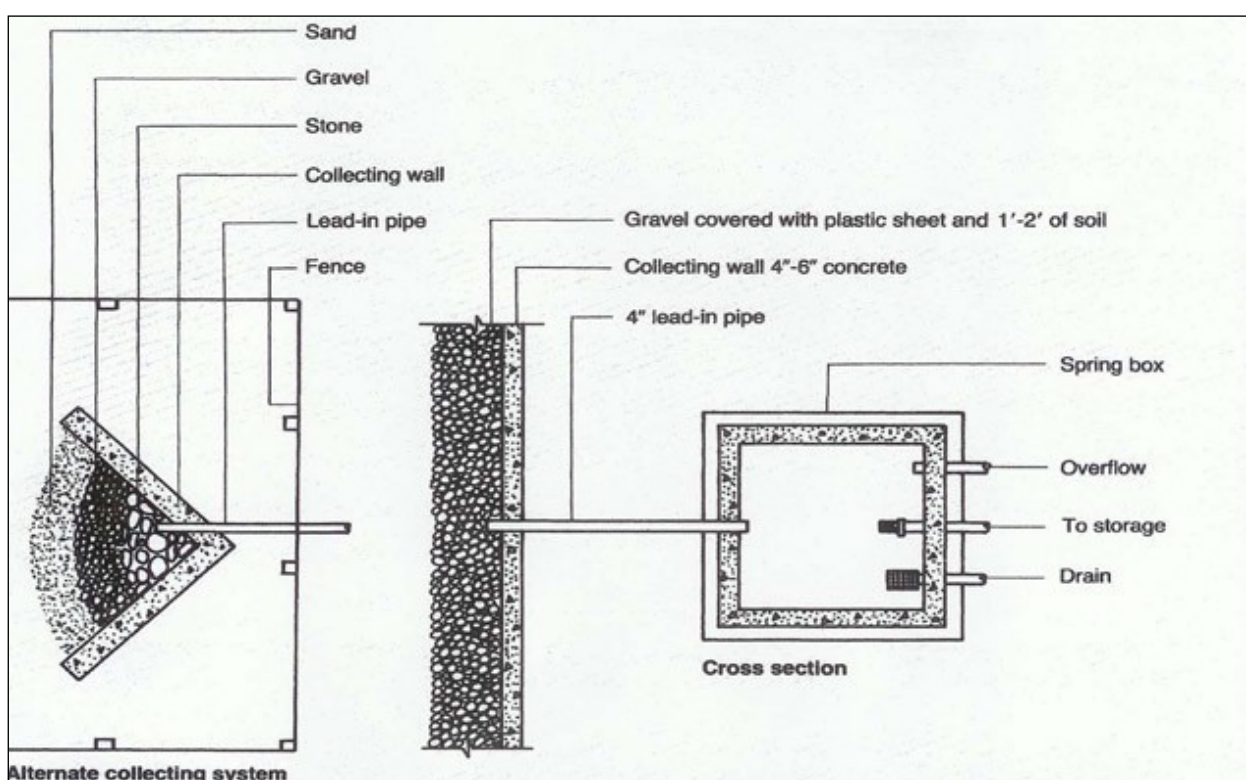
Alternative collecting system and cross sectional view of concentrated spring
